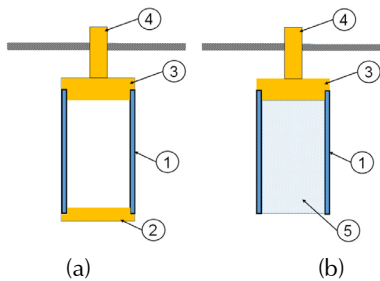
Structure of a semi-assembled foundation using a sewer pipe: (a) foundation with closed-ended sewer pipe, (b) foundation with open-ended sewer pipe. (1): Pre-manufactured sewer pipe, (2): a concrete slab that covers the bottom of the sewer, (3): The manhole cover is also the foundation footing, (4): the column neck, (5): compacted sandy soil.
